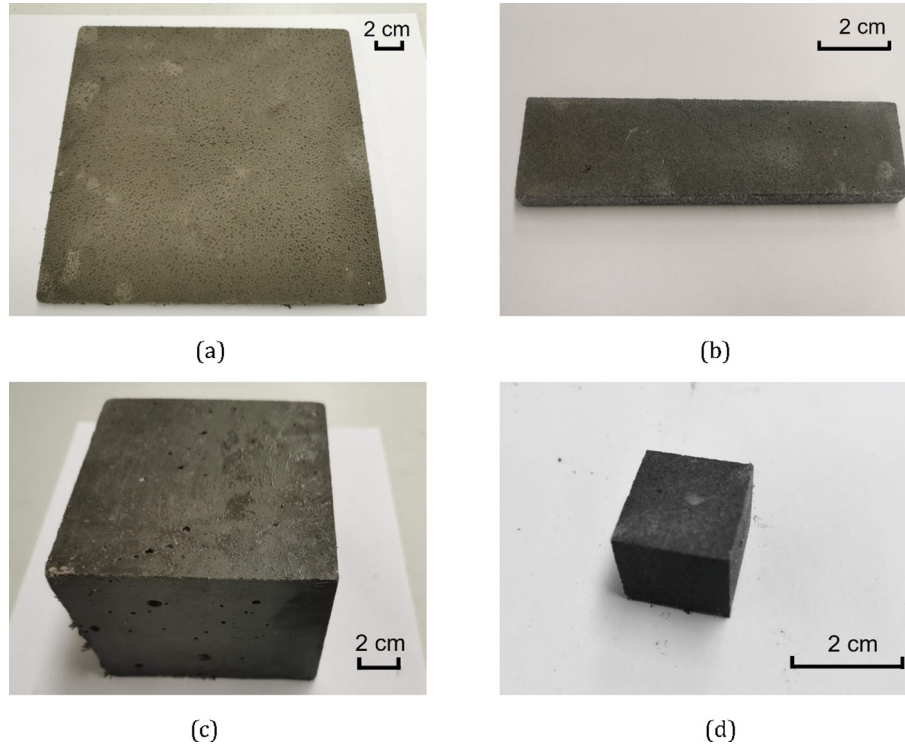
Specimens before cutting and after cutting, a) plate specimen; b) bar specimen; c) 100 mm cube; d) 20 mm cube.
